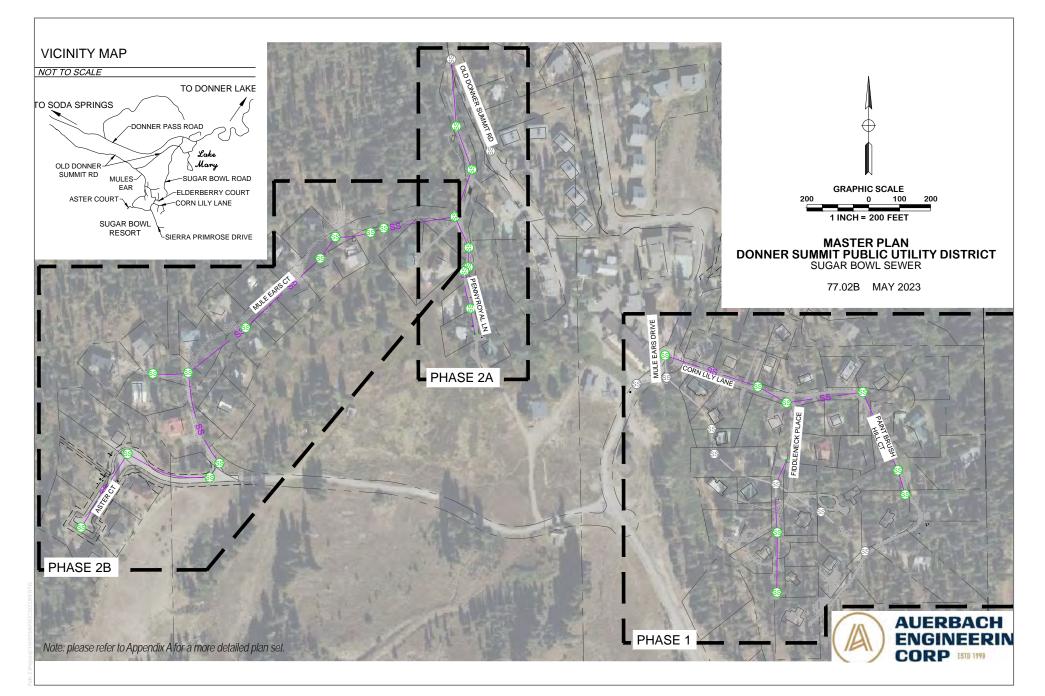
Project Plan Overview Sugar Bowl Sewer Extension Project
